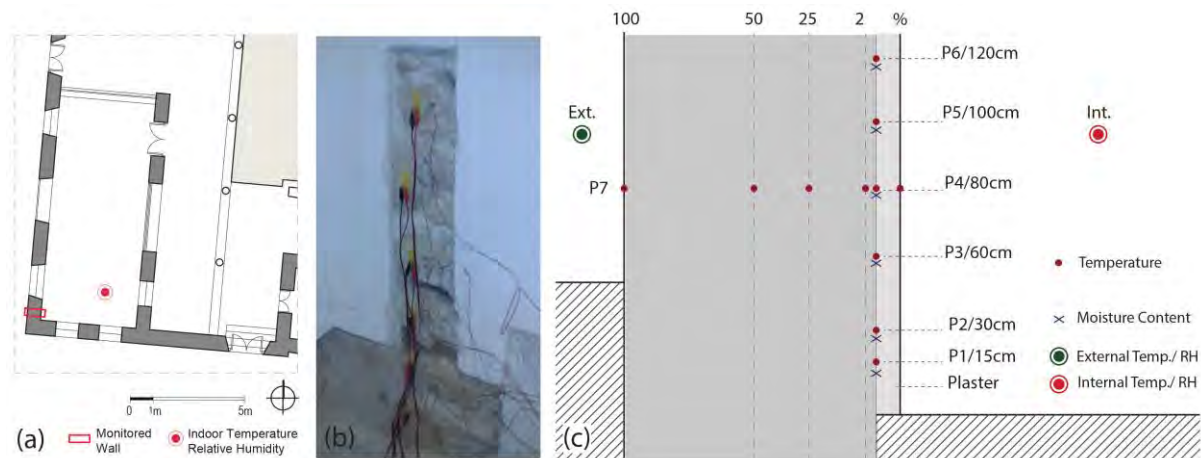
(a) Plan of the building under study (b) In situ monitoring (c) Sensors layout in the stone masonry wall
